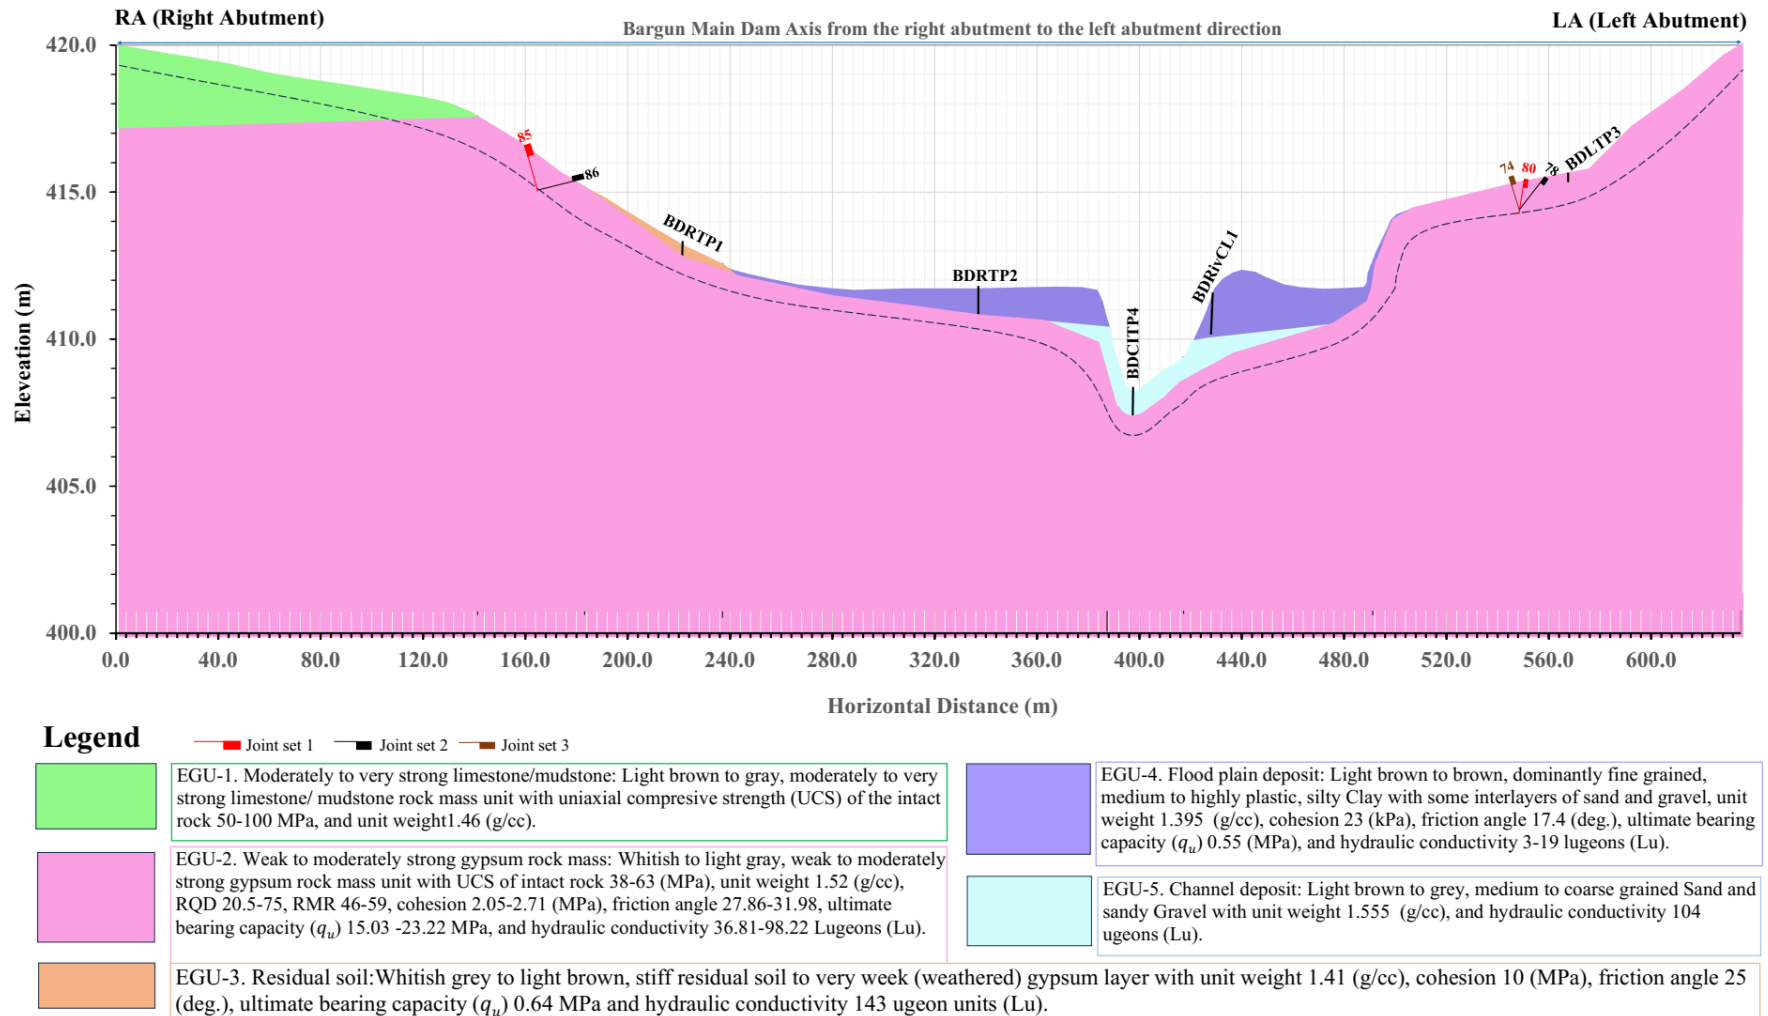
Engineering geological cross section of the main dam foundation from right to left abutment with test pit and joint set locations
